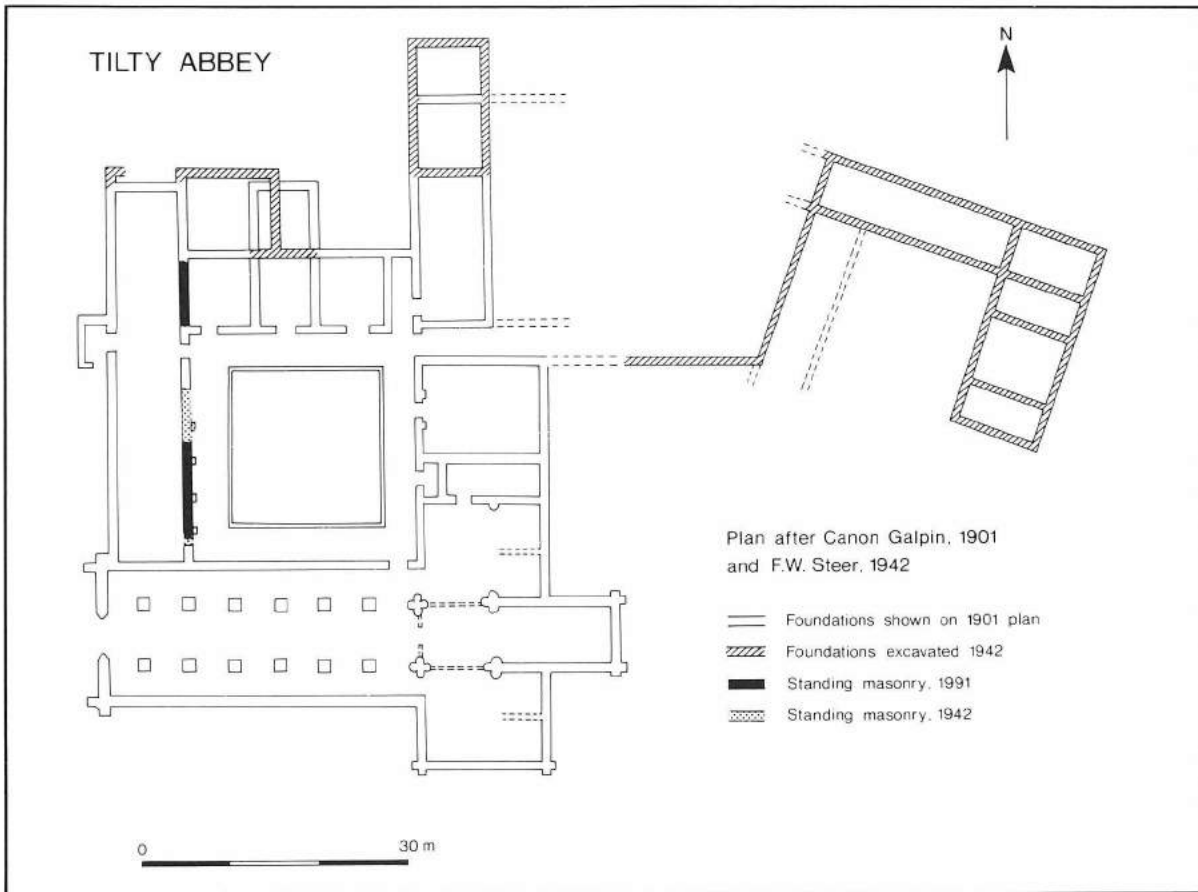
Tilty Abbey; plan of buildings after Galpin (1928) and Steer (1949).
